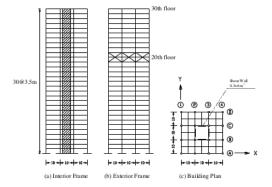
The 30-Story SFBT Building Considered by Pudjisuryadi and Lumantarna [5,6]
